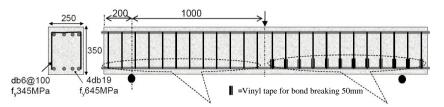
Details of specimen (Unit: mm) (Toongoenthong and Maekawa 2005b)
